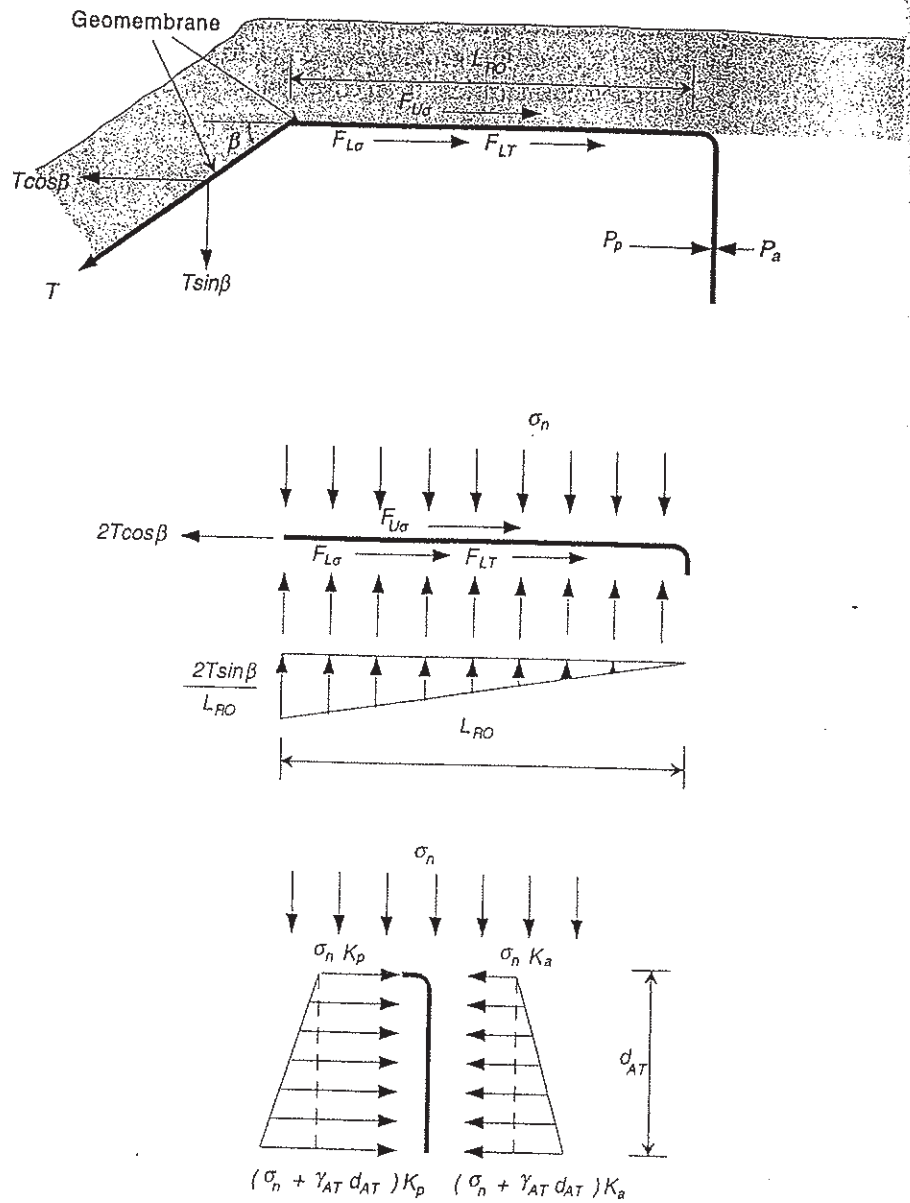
Cross section of geomembrane runout section with anchor trench and related stresses and forces involved.
